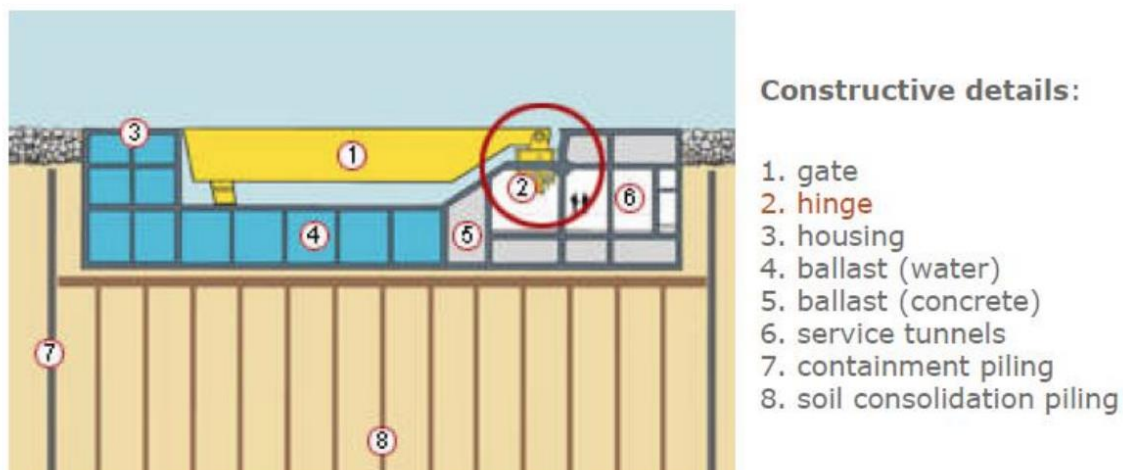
Section of the barrier with construction elements (Lo Storto, 2015)
